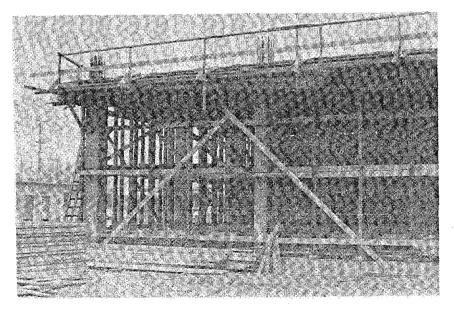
Forming method for one-way slab and flat beam construction in a telephone equipment building.
